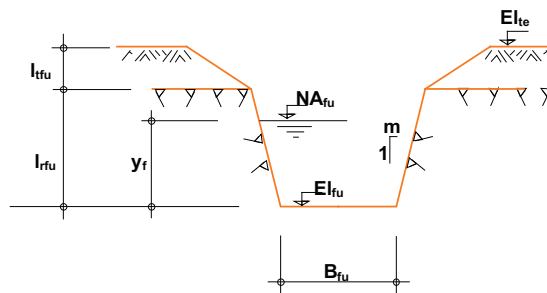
Typical cross-section of a tailrace canal.
